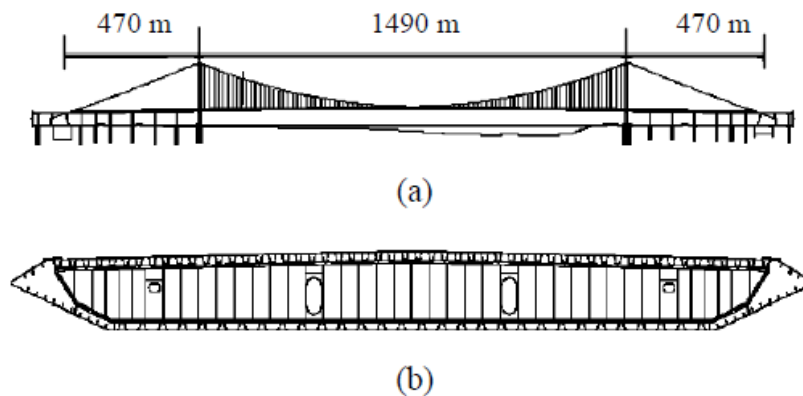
The Runyang Bridge, elevation of the bridge is presented in a), and the cross-section of the girder is presented in b) (Zhang & Ying, 2006).
